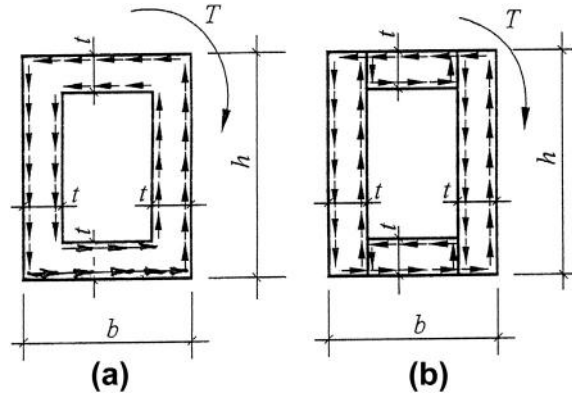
Shear stress flow on box section: (a) integral section, (b) dividing into rectangles
